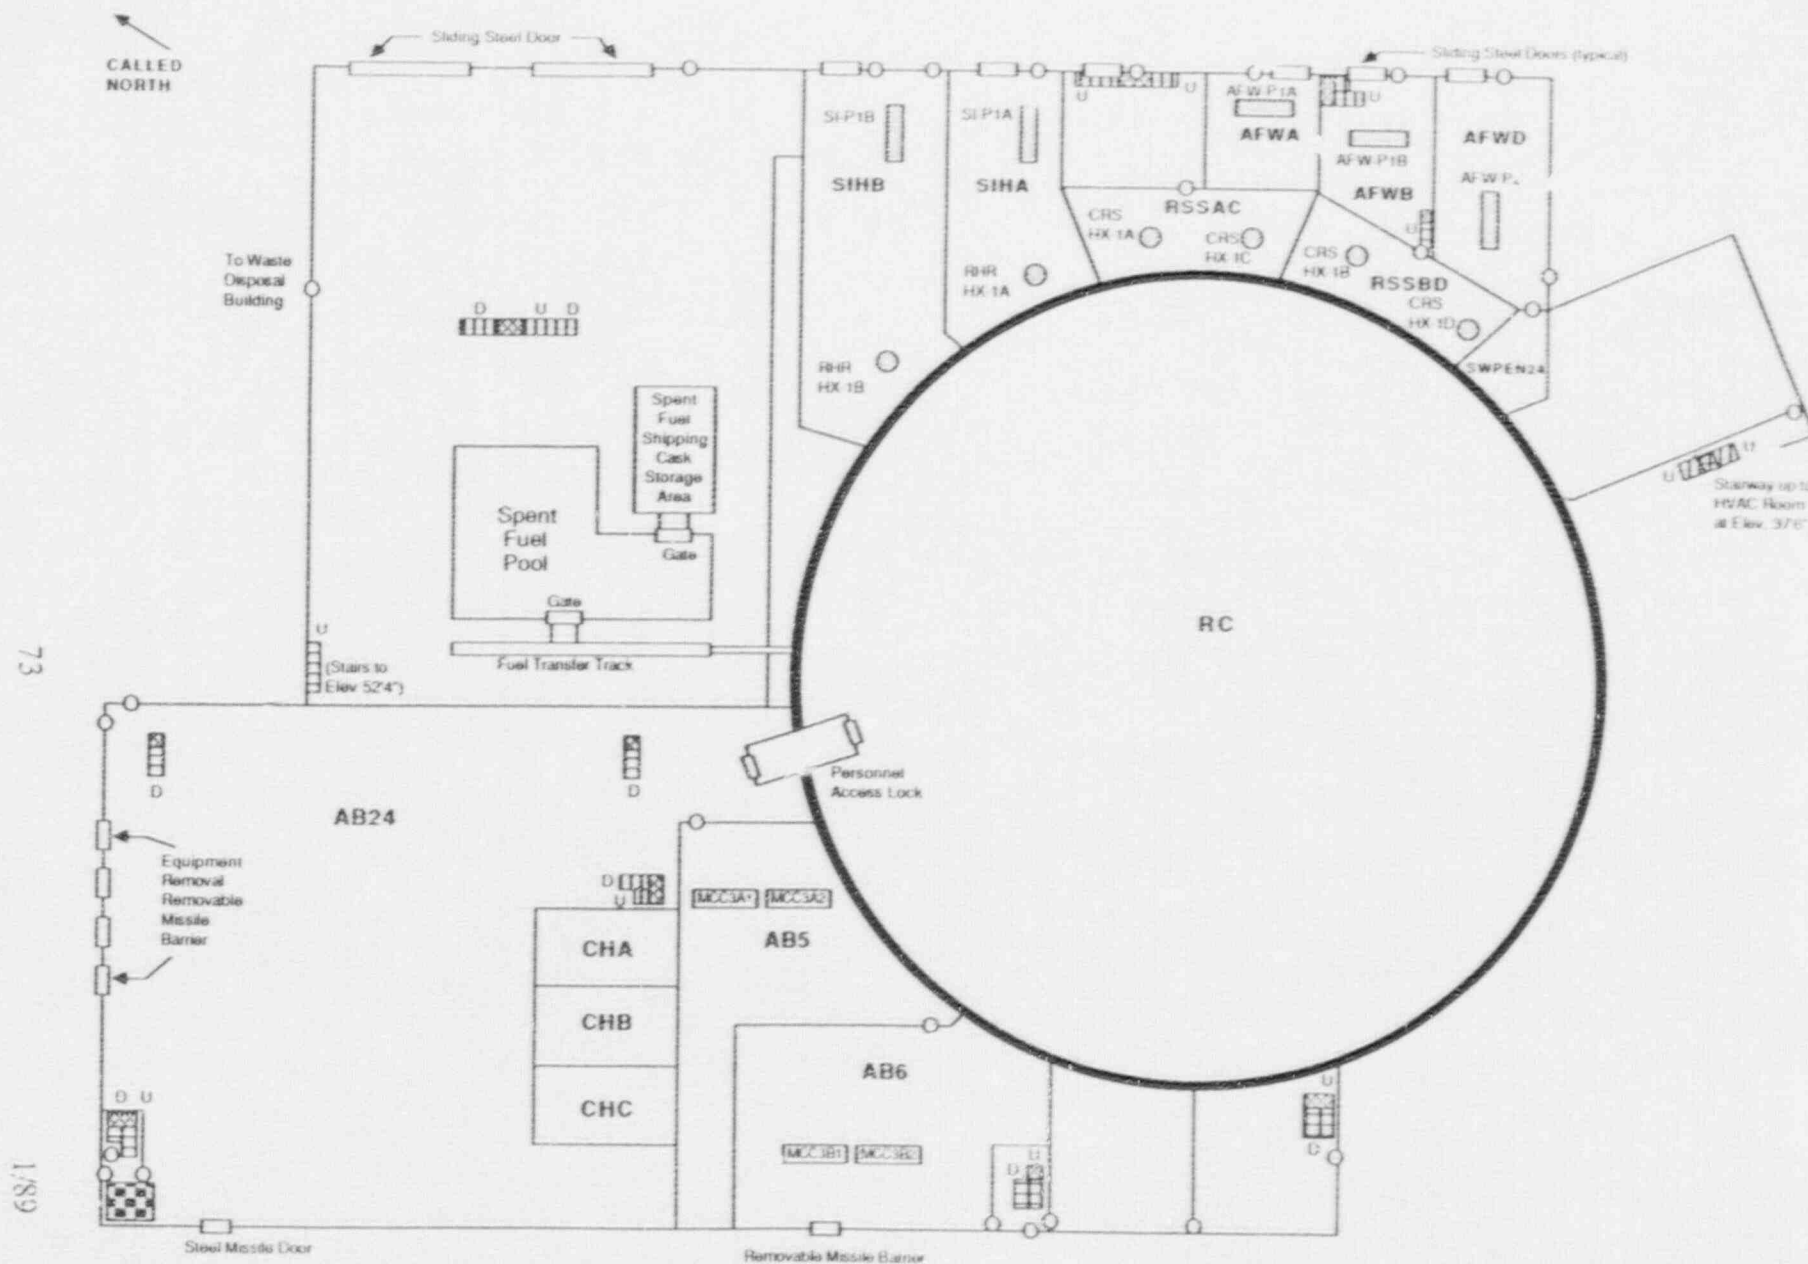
Millstone 3 General Arrangement, ESF, Fuel, and Auxiliary Buildings, Elevation 3'-8".
